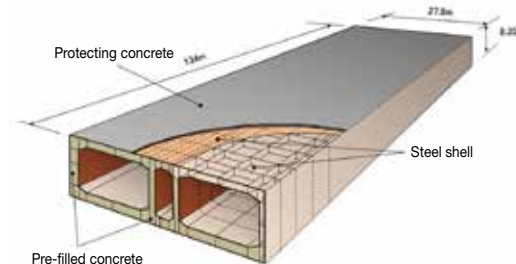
Steel-concrete composite structure of Full-sandwich type
